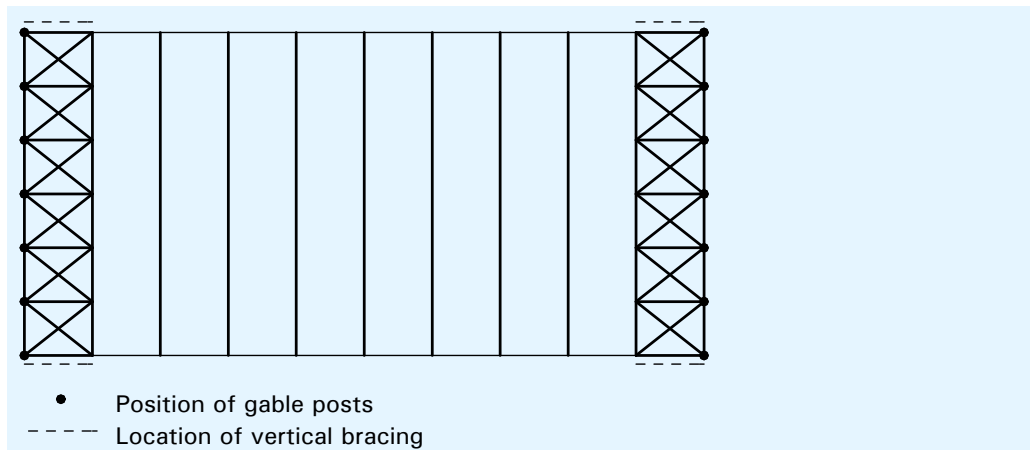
Plan view showing both end bays braced using crossed angle sections
